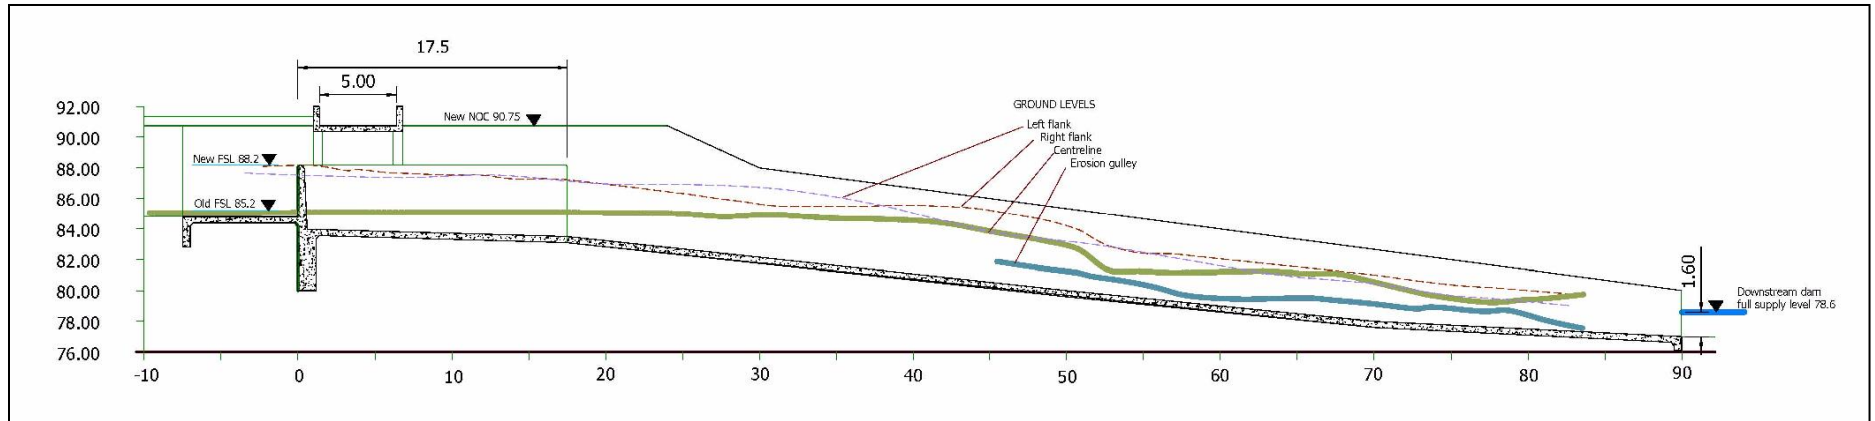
Spillway Longitudinal Section with typical energy dissipater
